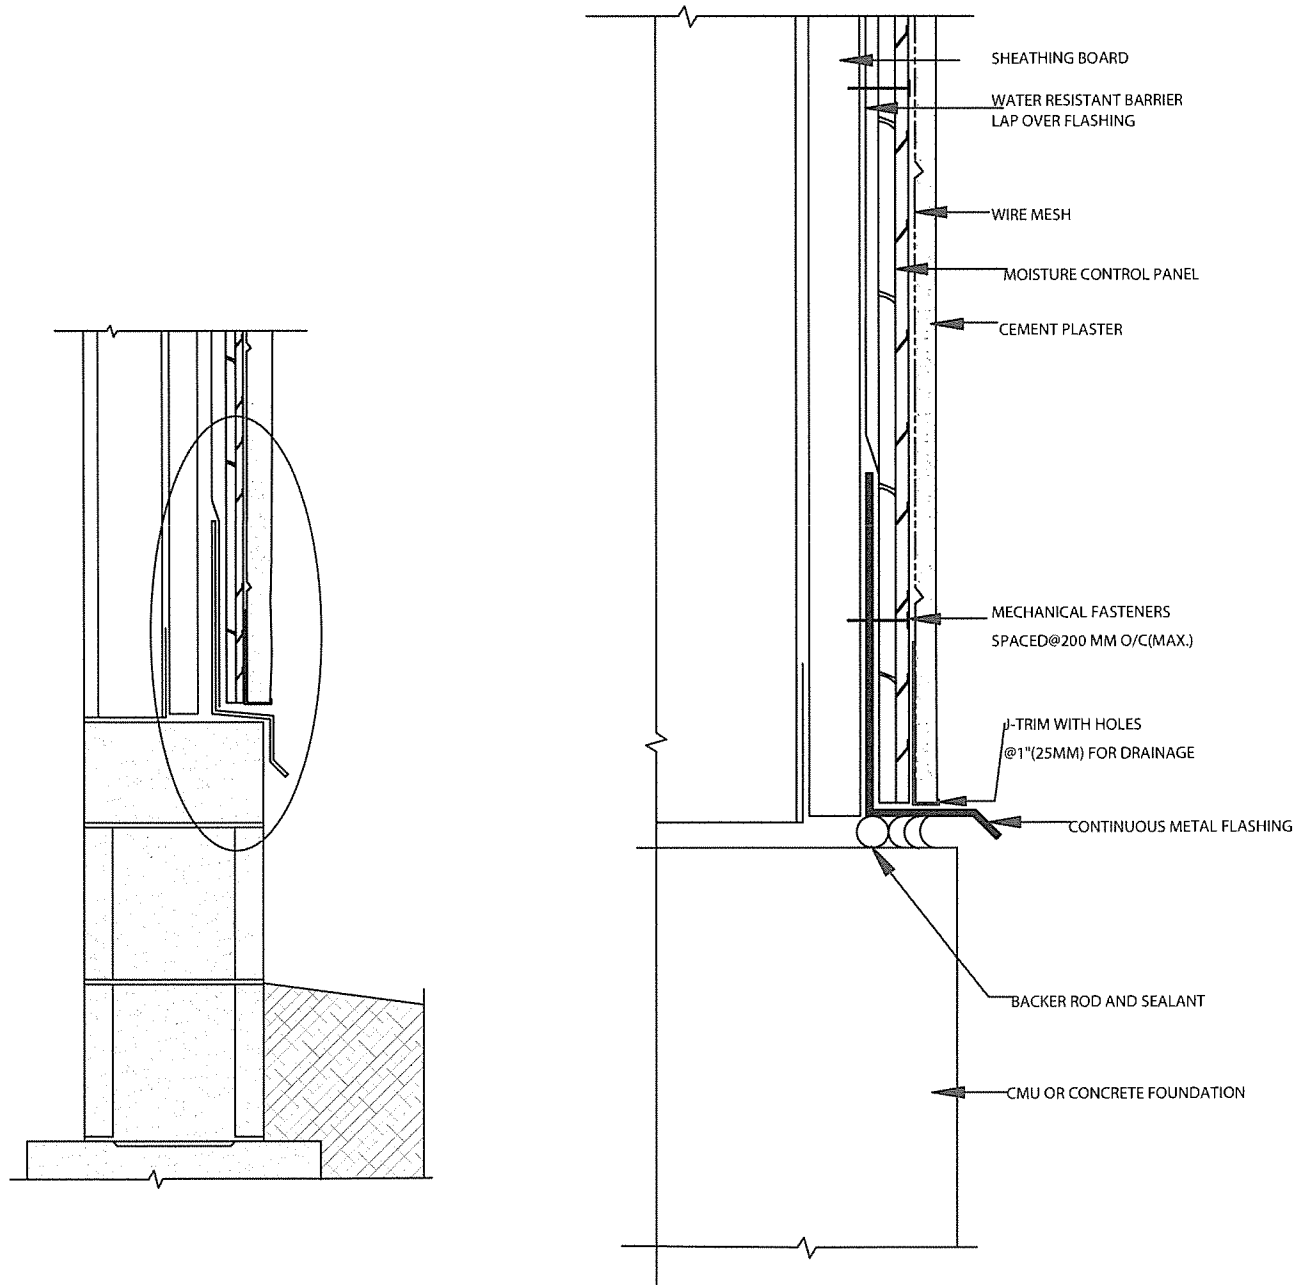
TERMINATION AT FOUNDATION /FINISHED GRADE
